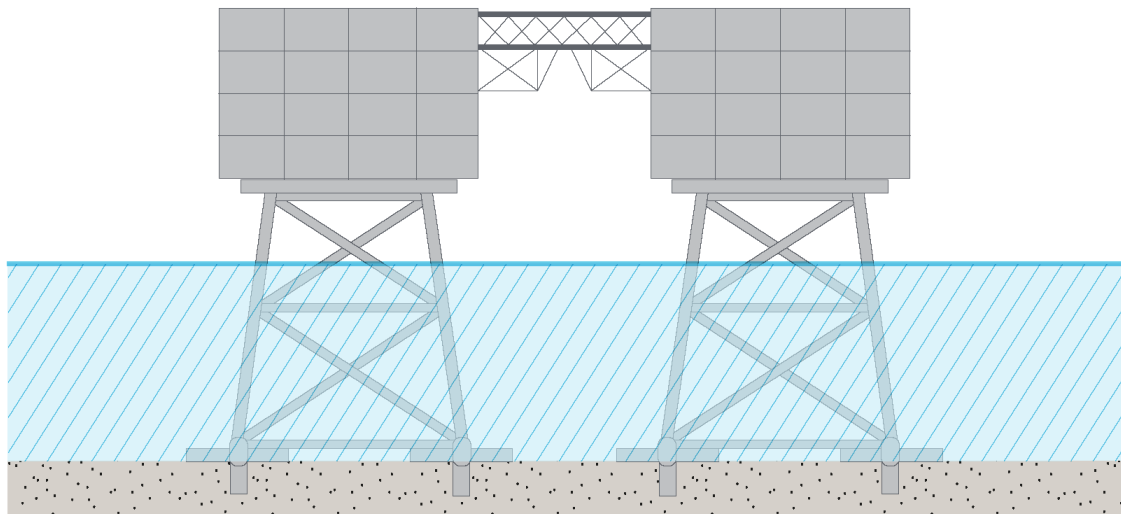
Illustration of typical Offshore Substation Platforms on piled jacket foundations connected by a bridge link (referred to as the bridge-linked High Voltage Direct Current Offshore Substation Platform and considered as a single structure) (not to scale)
